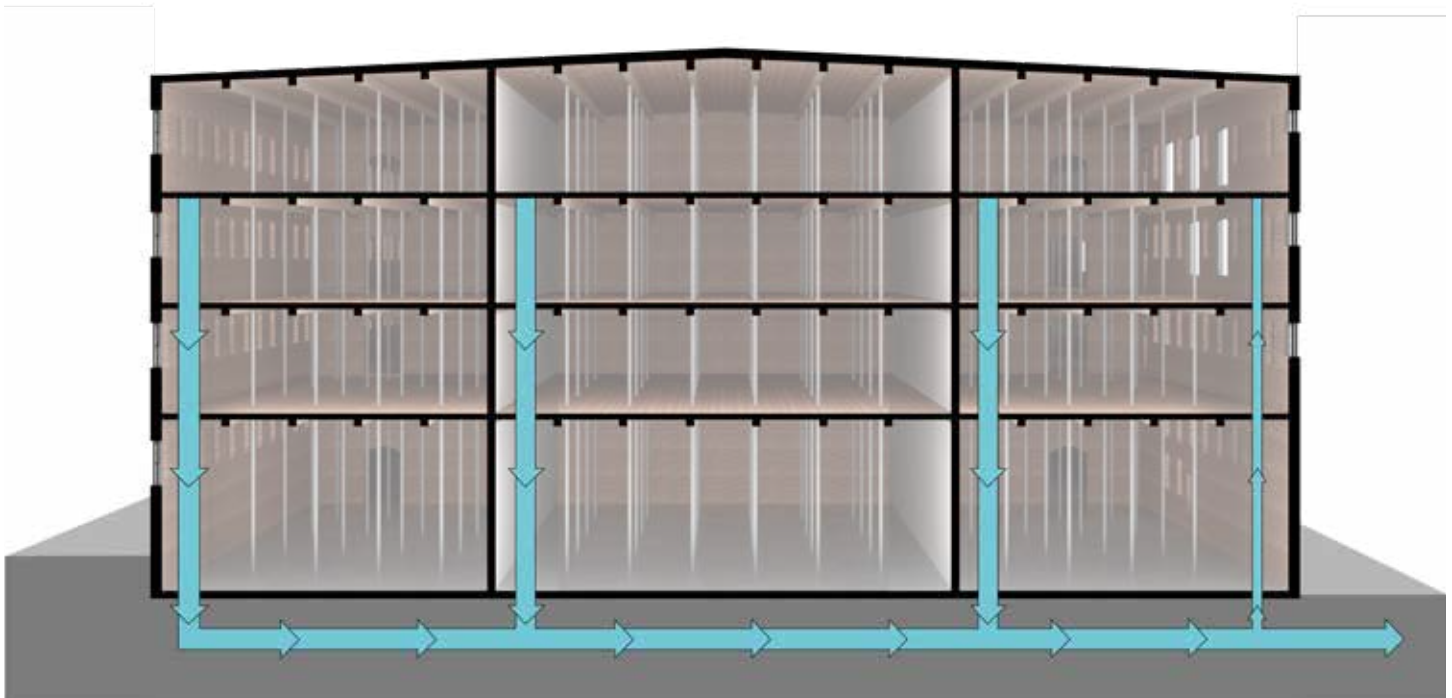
104 Anawan Greywater Reuse Section Perspective (Source: Morgan Warner)
